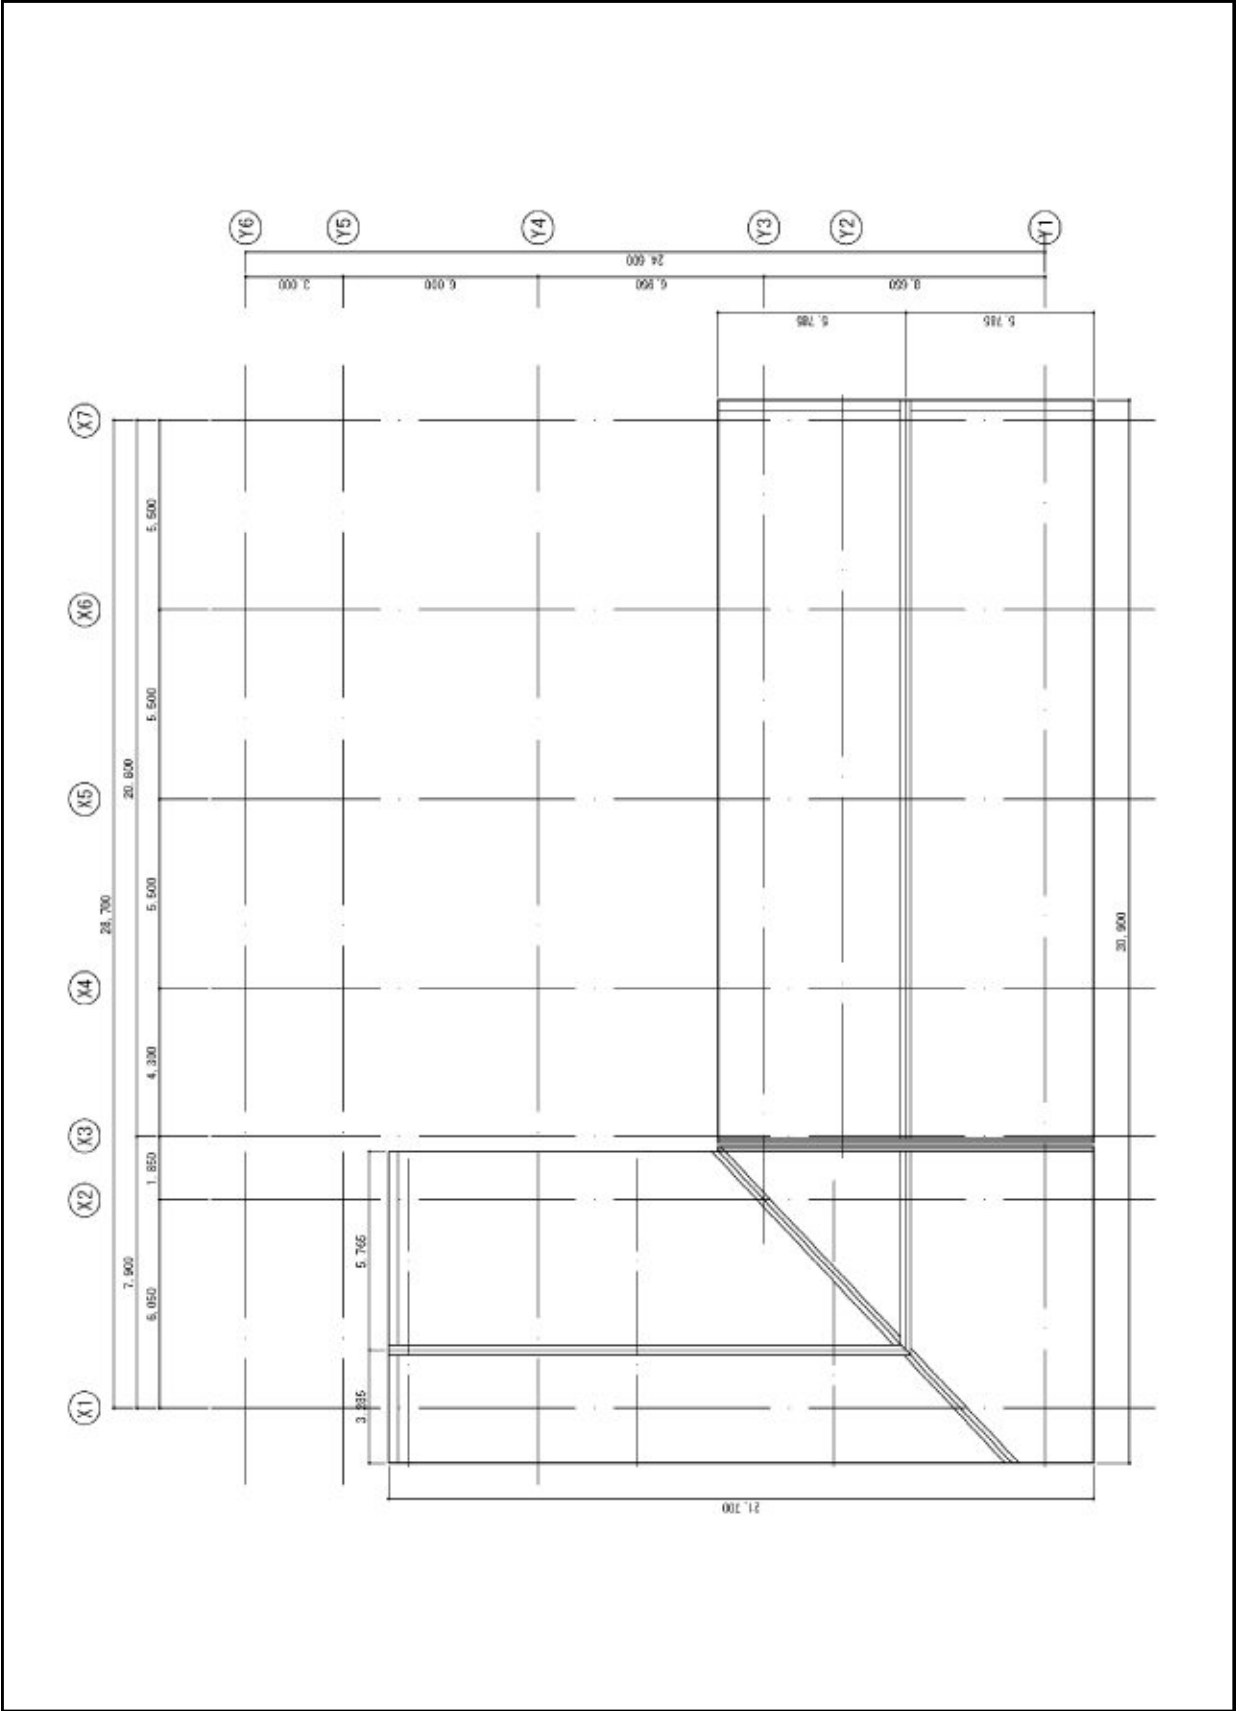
(15) Roof Framing Plan of New Fisheries Center
